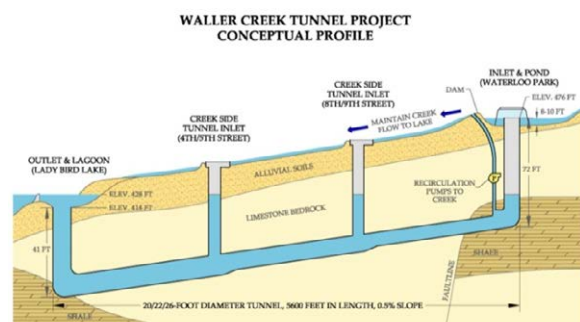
Waller Creek Tunnel (Source: Kellogg Brown & Root Services and Espey Consultants, 2008)
